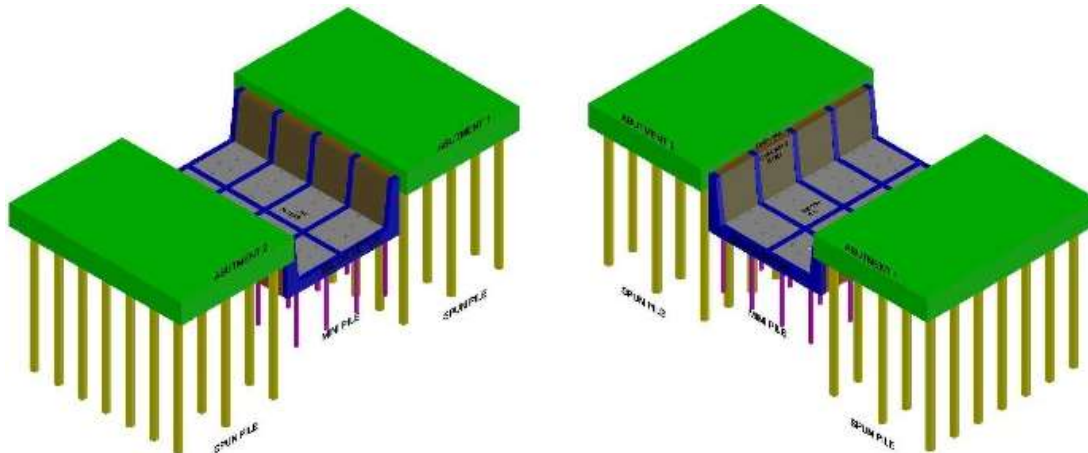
Illustration of beam reinforcement supported with mini piles inside the excavated area
